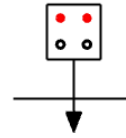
Possible approaches to consider the failure crack initiation for concrete edge failure in case of groups with two anchor rows without hole clearance
